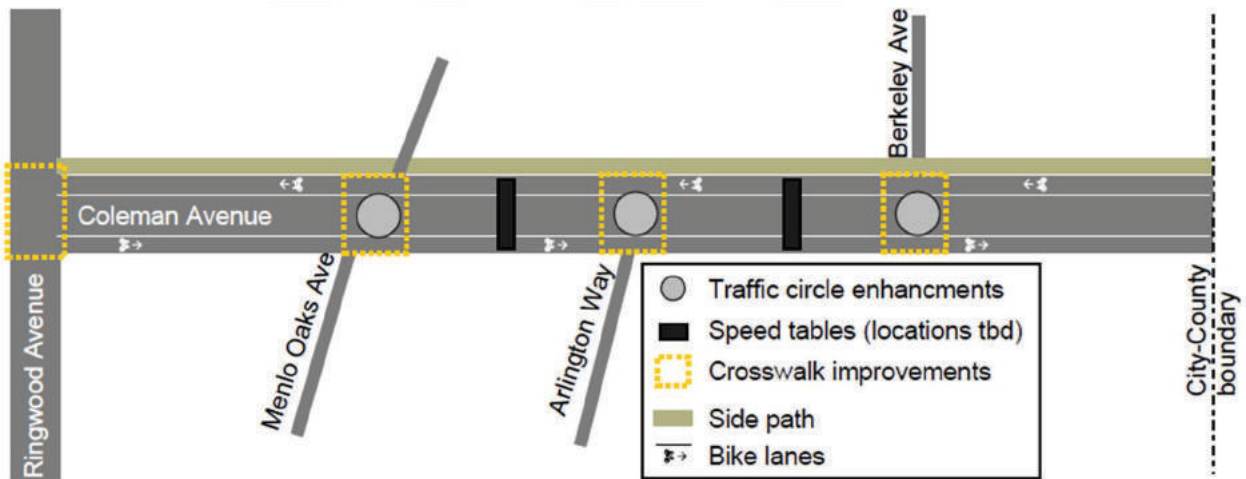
Coleman Avenue (Menlo Oaks) Preferred Long-term Plan View Schematic
